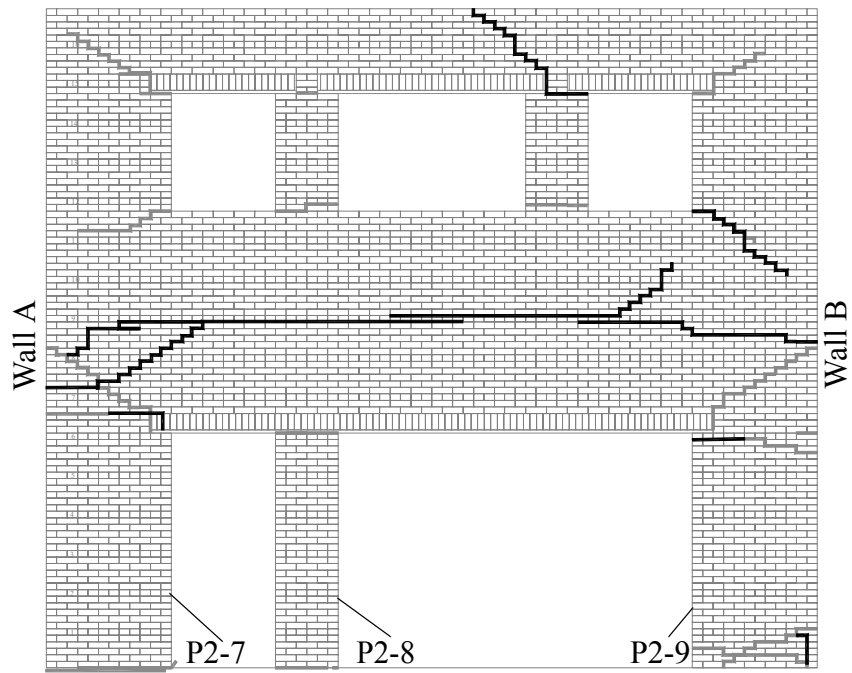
Crack pattern of Wall 2 following Test Run 26.
